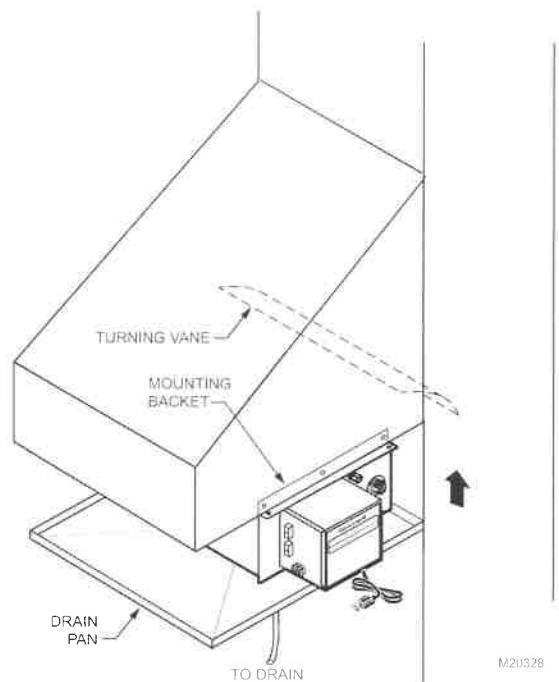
Mounting humidifier horizontally under duct extension using mounting bracket.
